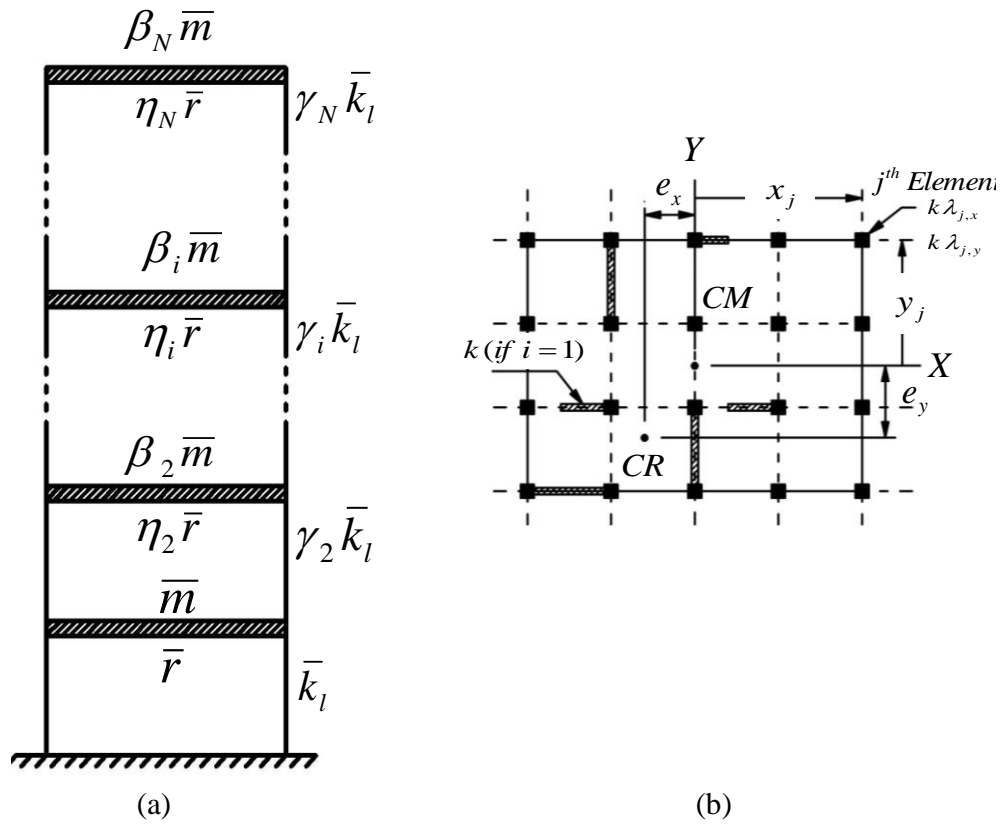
(a) Torsionally coupled N – story building; (b) Plan view of the i^{th} floor
